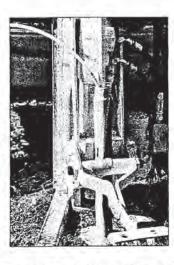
A grout machine and flexible tubing allow bottom-up grouting as the outer casing is retrieved.
